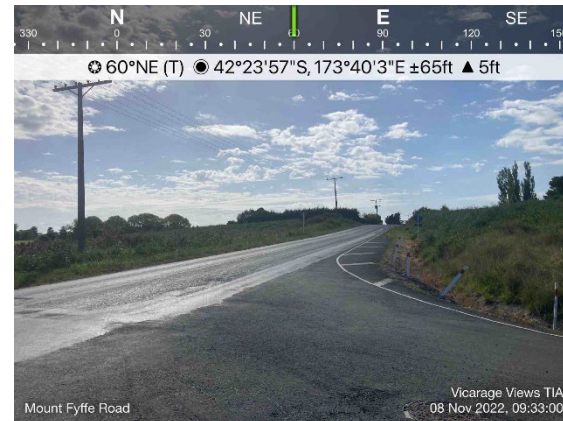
Sight distance from the Ludstone Road/Mt Fyffe Road (south) intersection to the east
